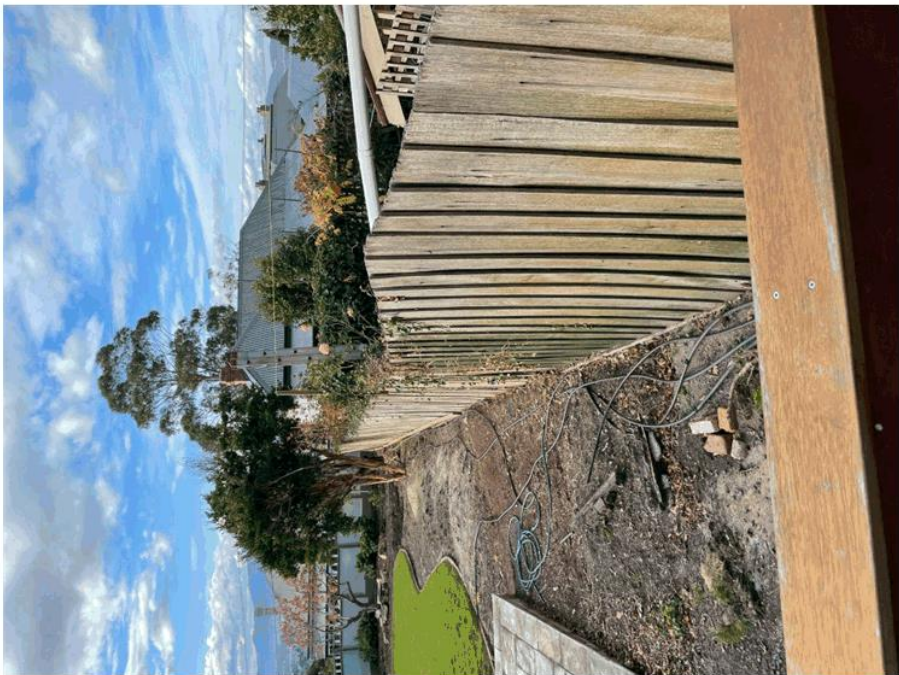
View of building site from deck to be demolished (Officer photo, 2022)
